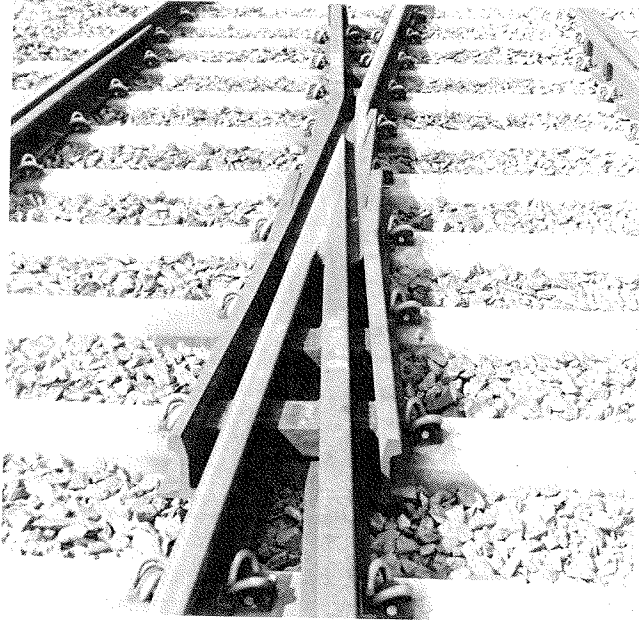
Bairitic cast center crossing with welded-on legs.
